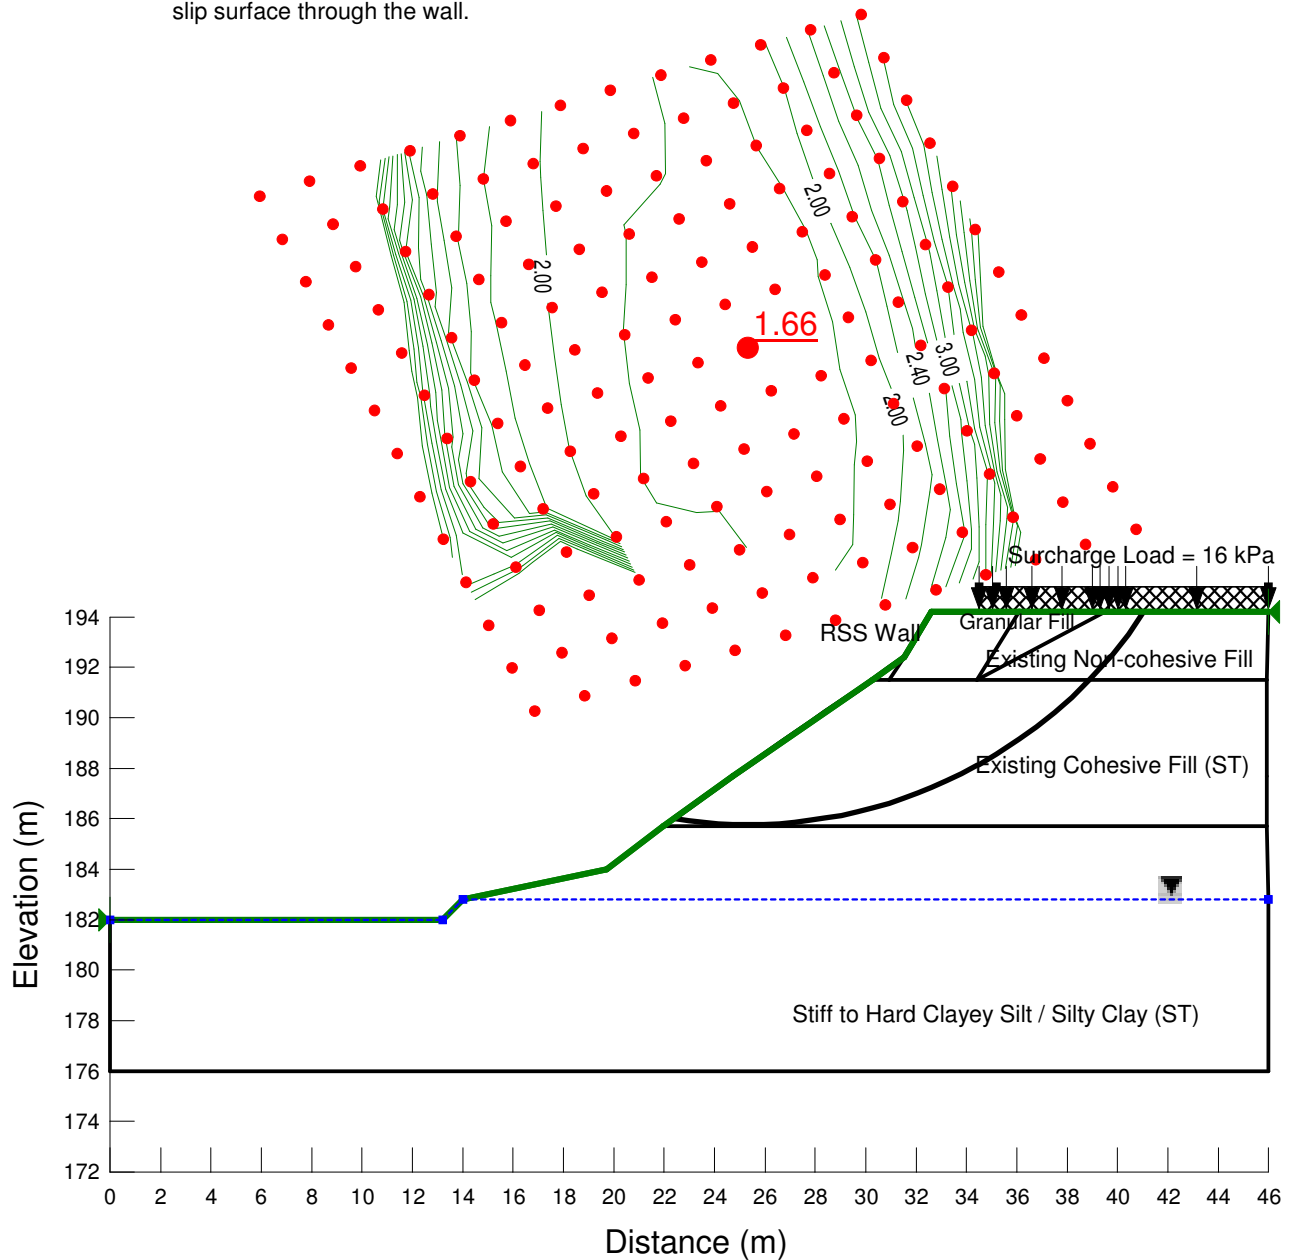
Slope Stability Analysis including Proposed RSS Wall, beside culvert - Sta. 15+205
